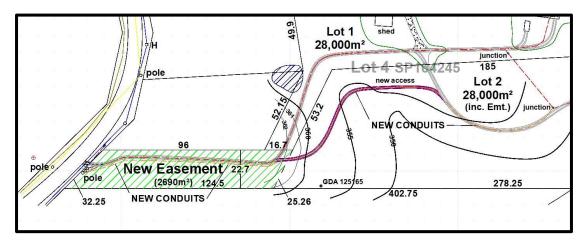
Proposed new reticulated infrastructure provisions (STP).
